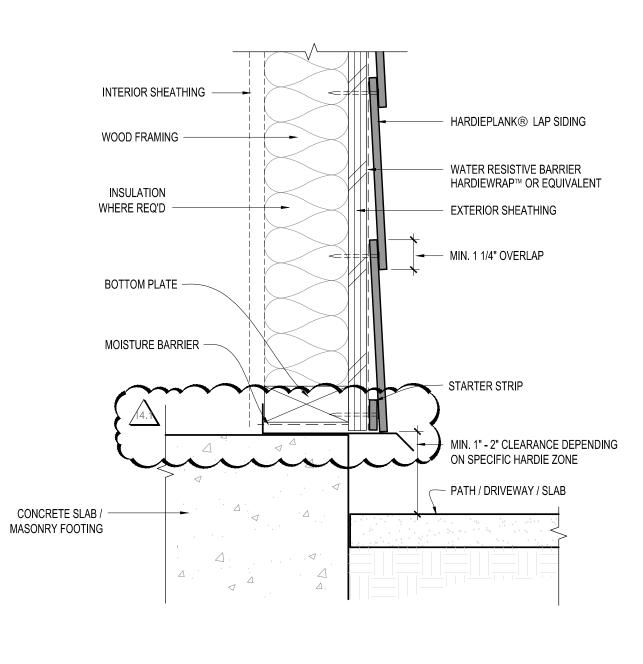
DETAIL - SIDING TYPICAL WALL A-4.1 / SCALE: 3" = 1'-0"
